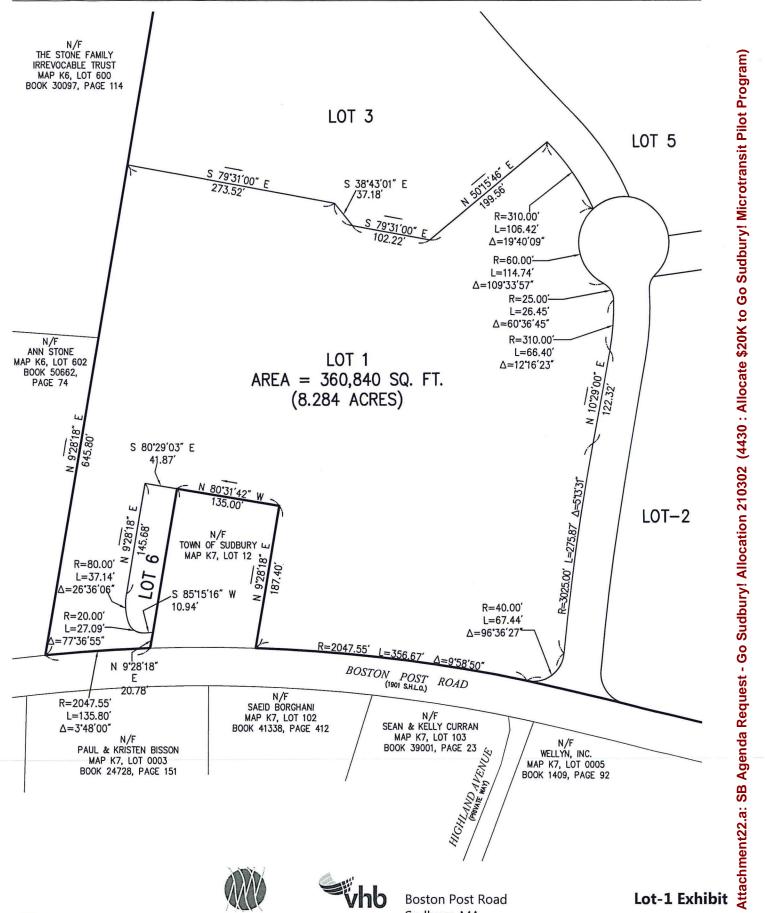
EXHIBIT B Land/Easement Conveyance Plan for Future Fire Station
